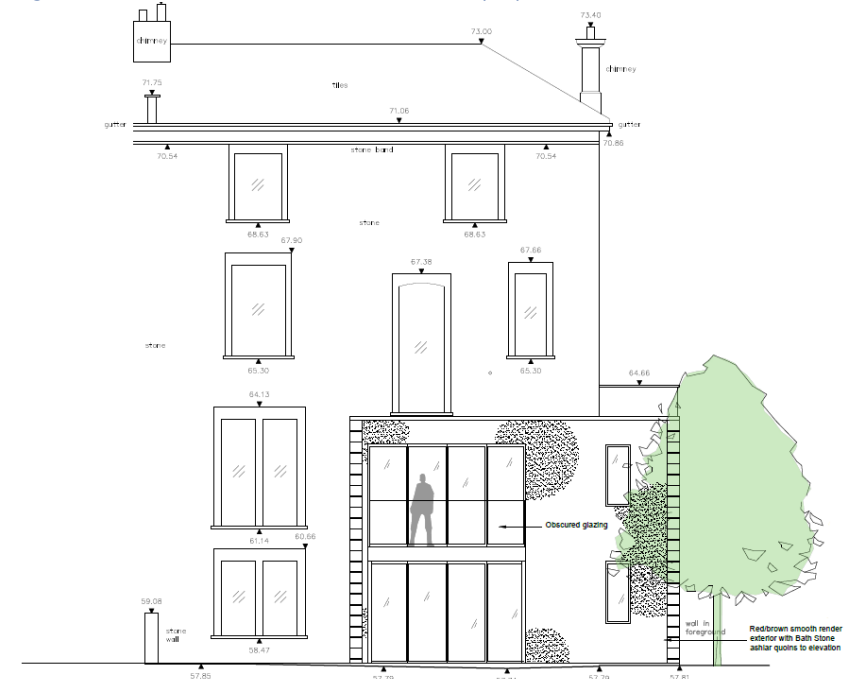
7 All Saints Road - 19/01168/H – proposed rear elevation
